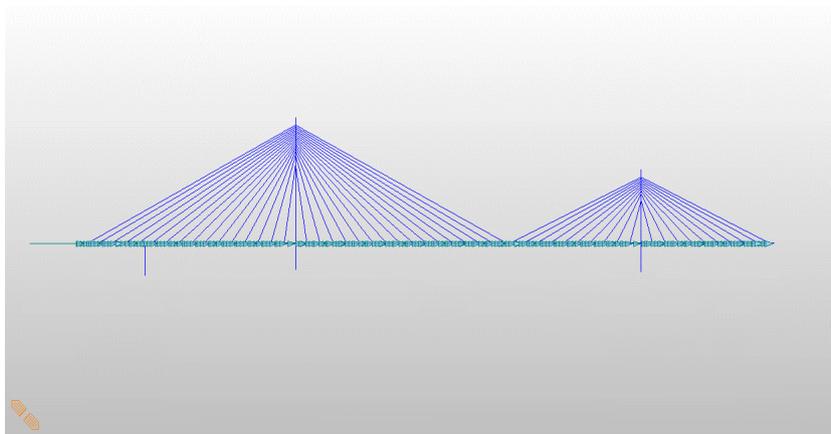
Longitudinal Wind Force on Cable Stayed Bridge.
